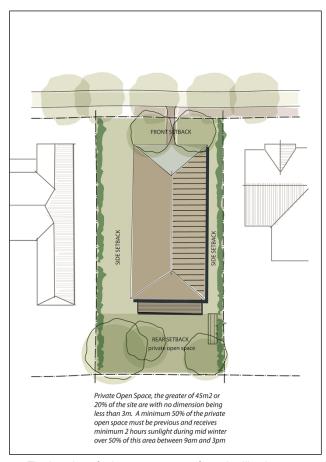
The location of private open space for a dwelling house, attached dwelling house or a semi-attached dwelling house
